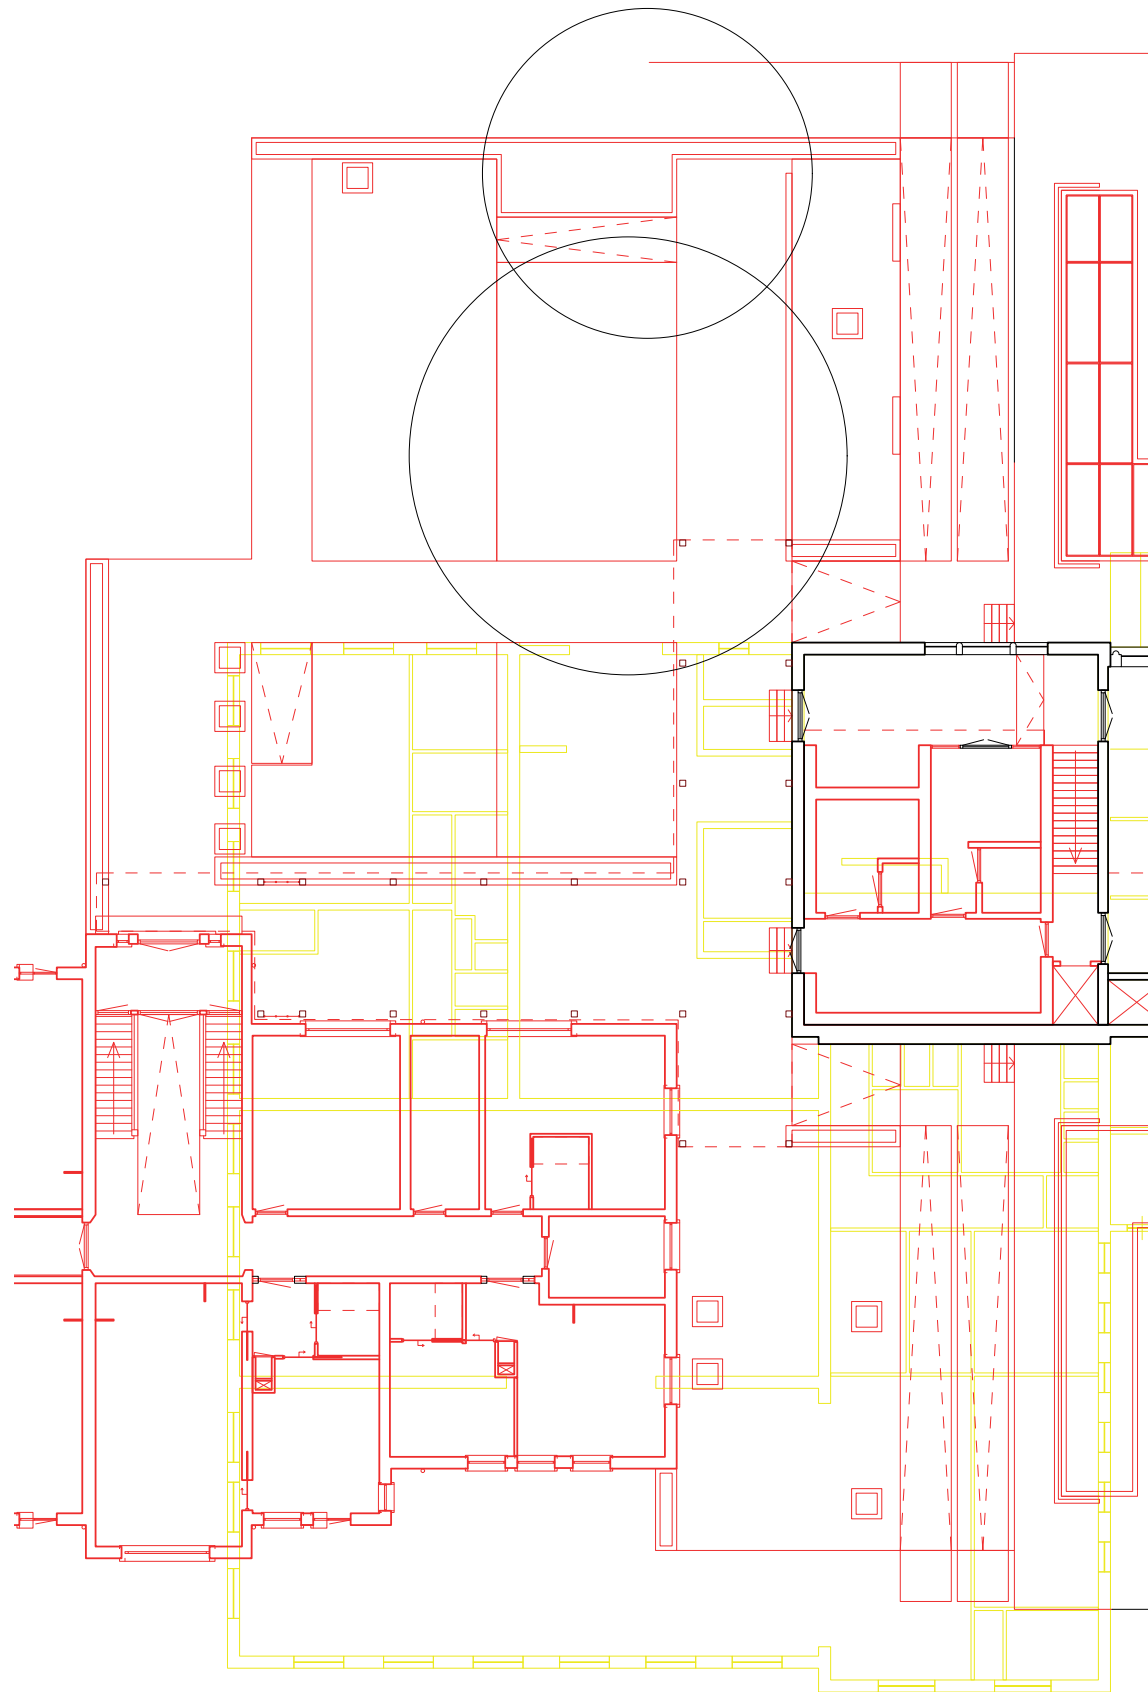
Ground floor plan 1:200 (scaled to fit page) with a focus on the existing keukengebouw and newly added platform. Notice the height differences
